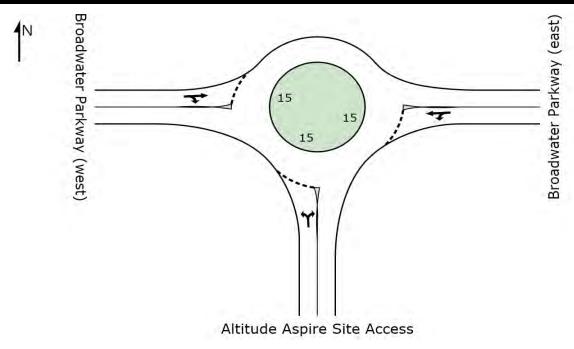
Planned Site Access/Broadwater Parkway Intersection Configuration
